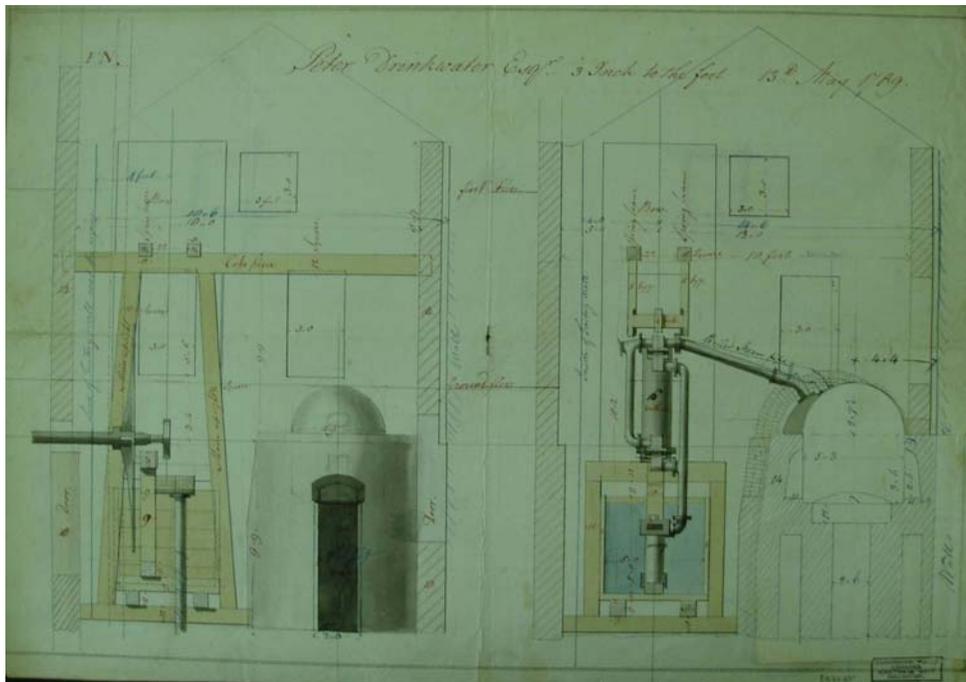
Final cross-sections of 1789 engine house by Boulton and Watt
